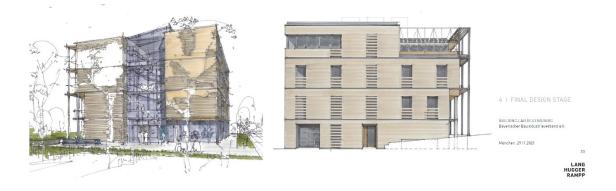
Building Lab Elevation East & West (Second Sketch) @LangHuggerRampp
